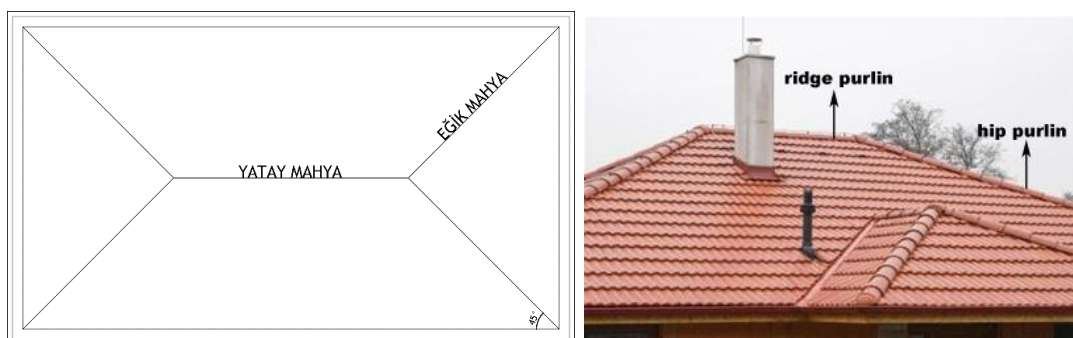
Ridge purlin and hip purlin on sloped roof
